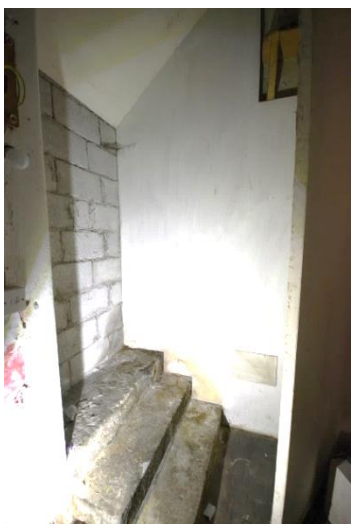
Room 21: Wing to west of stage showing 1911 granite steps and blocked door opening.
